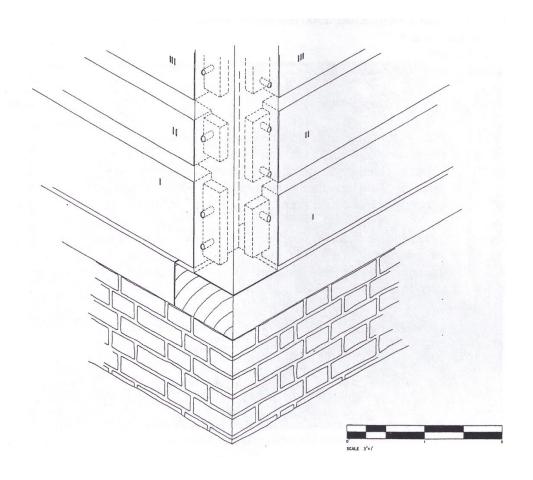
Johnson House, detail of post-and-plank construction at northwest corner. Courtesy of CHAD archives.
